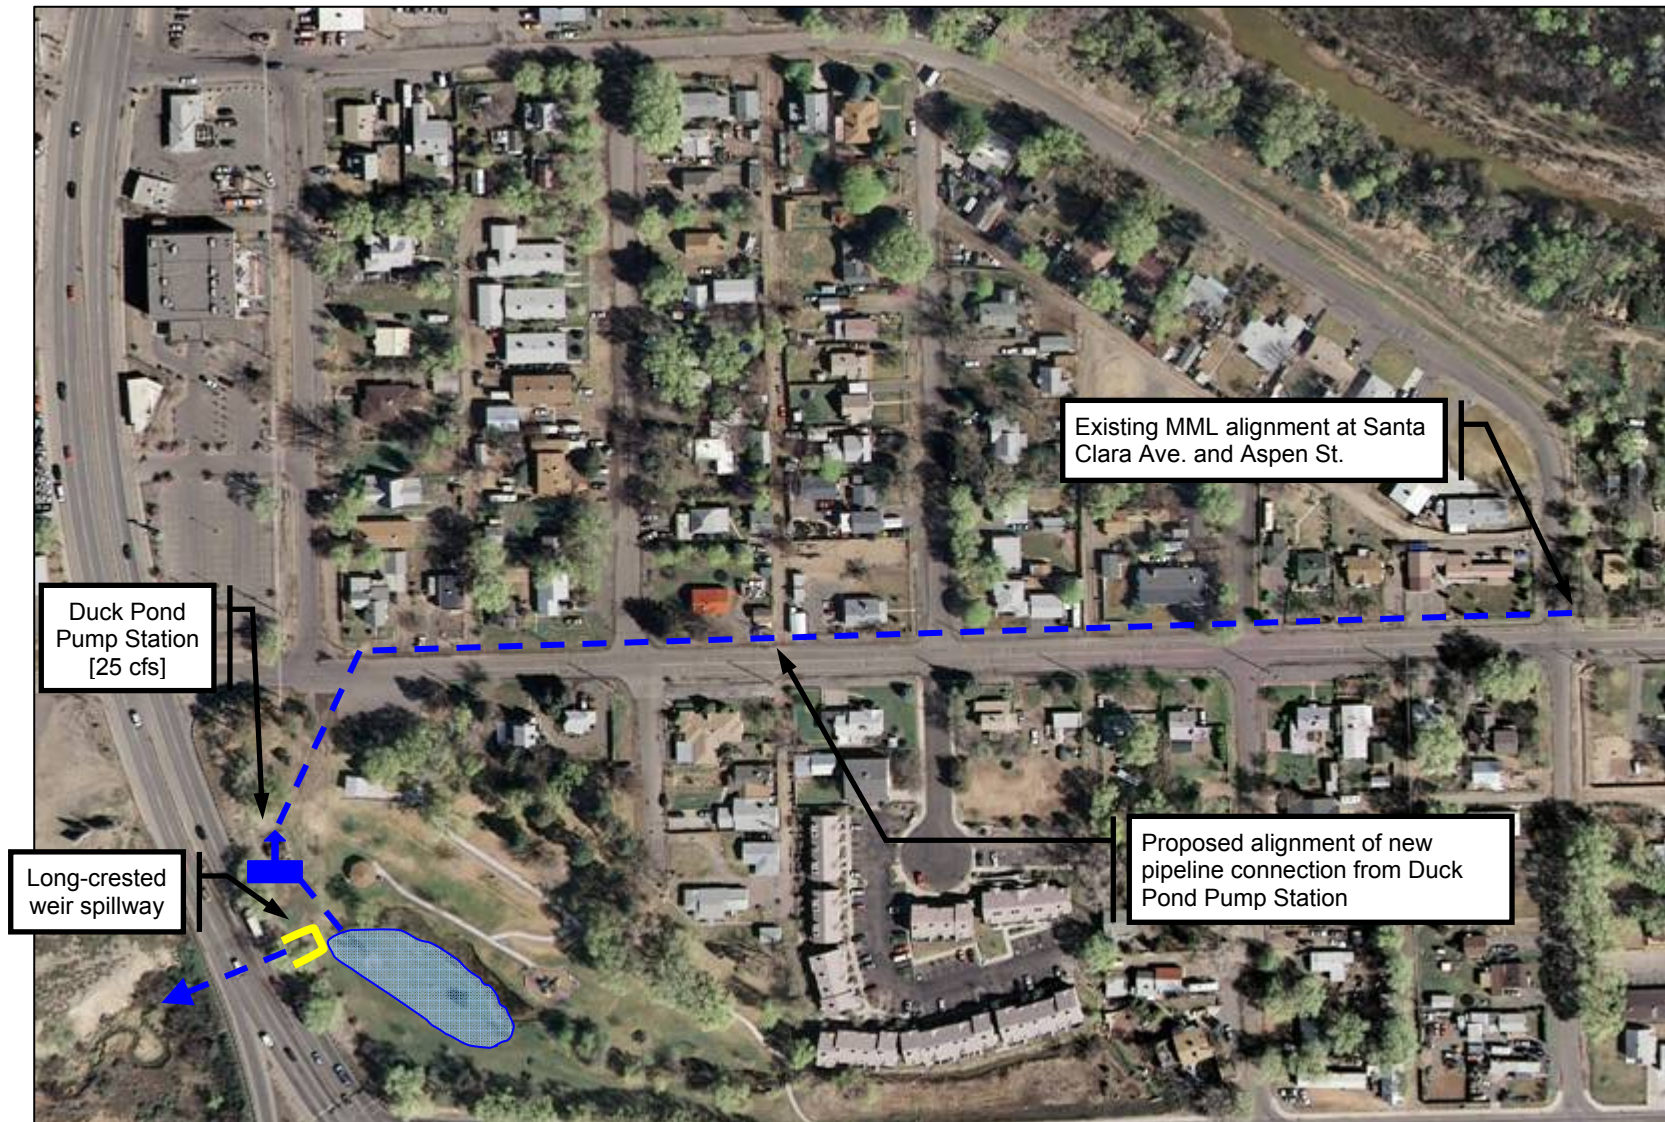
General overview of Duck Pond Park showing proposed system improvements and pipeline connection to the MML system
